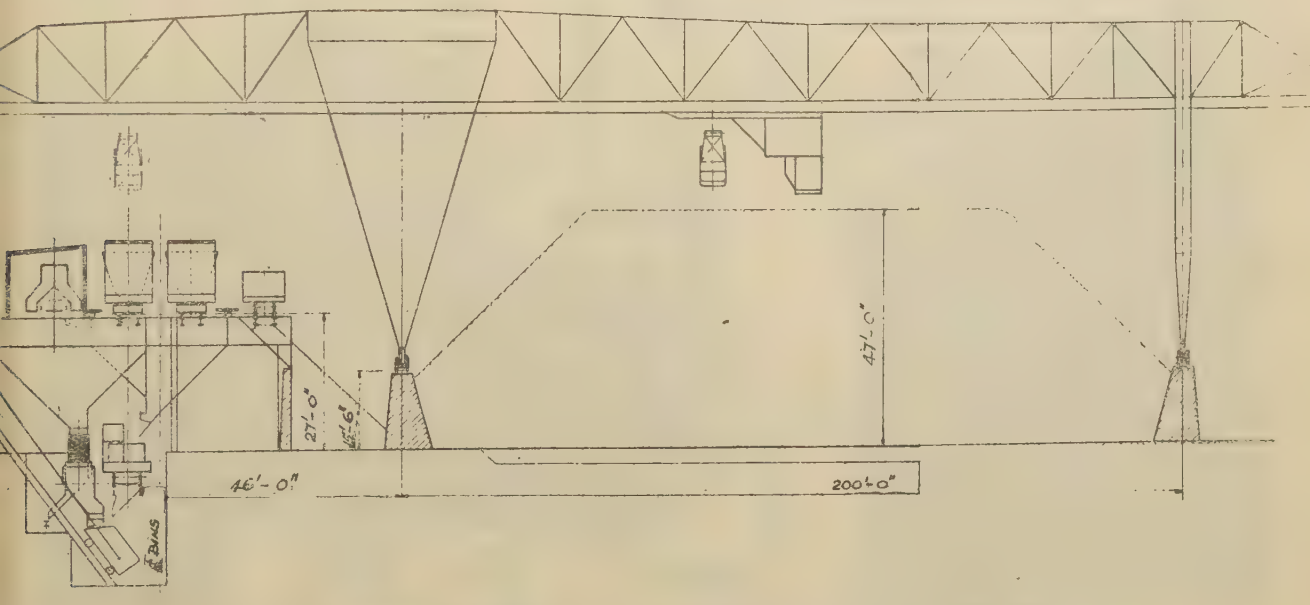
(b)—Sectional elevation of a modern blast-furnace plant (see Fig. 3 (a))
